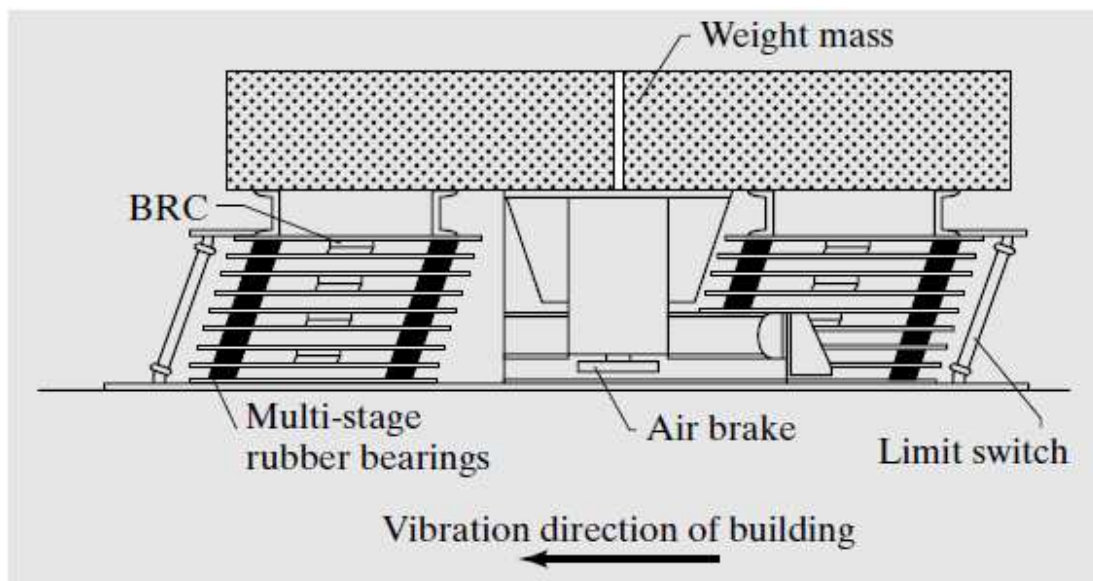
Tuned mass damper with spring and damper assemblage. [4]
